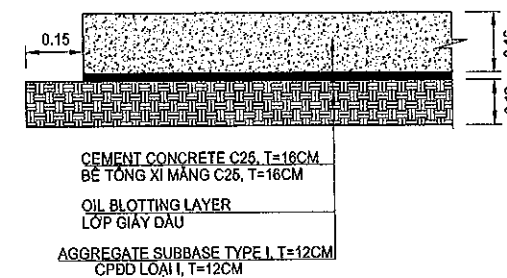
# DETAIL OF SLOPE PROTECTION / CHI TIẾT GIA CỐ MÃI DỐC
